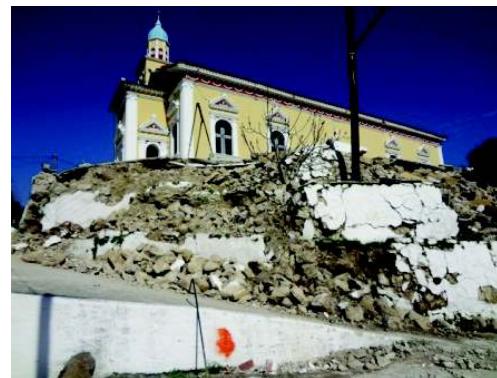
Failures at the stone retaining wall in Havriata village (EPPO, 2014)
